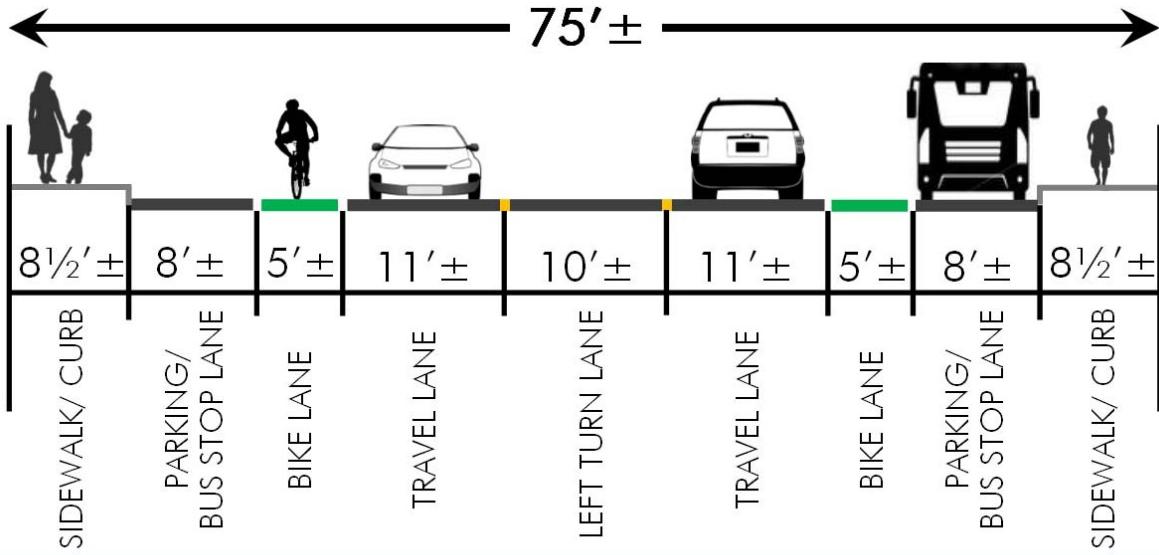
Existing Conditions of Massachusetts Avenue - Cross Section Sketch
